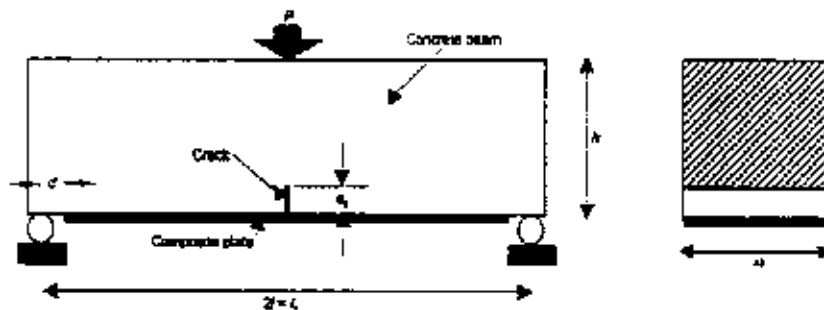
Schematic model of a rectangular cracked concrete beam strengthened by a externally bonded plate
